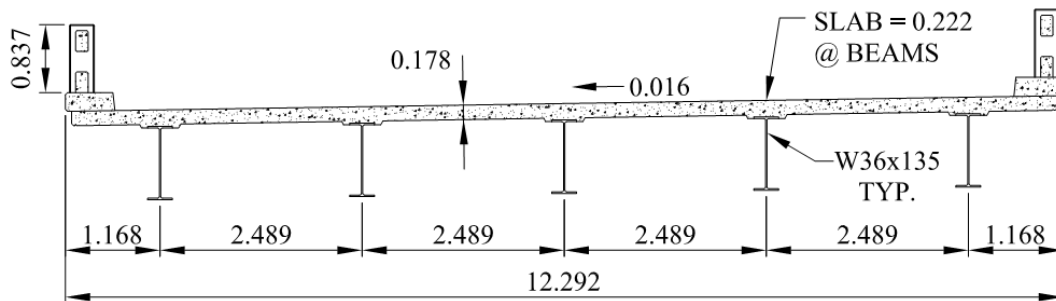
I-40 westbound over 4th Avenue: typical cross-section (m)
